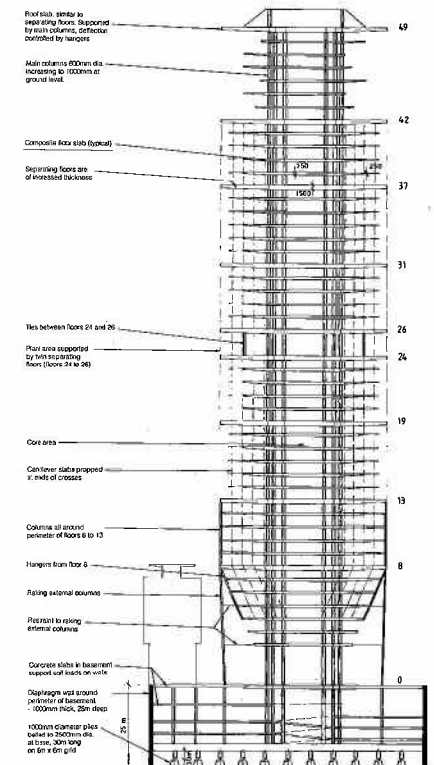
Section through tower showing "tables" and cantilevers of structure
